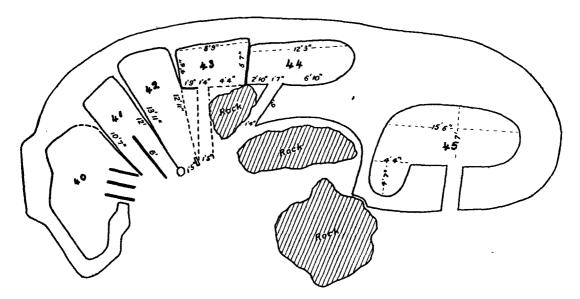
GROUND PLAN OF HOUSES NOS. 40 TO 45, SHOWING CERTAIN MEASUREMENTS.
